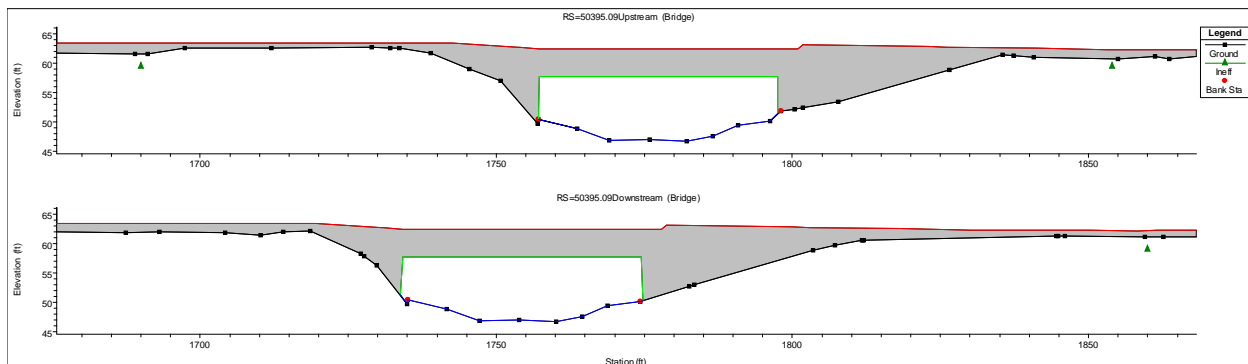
Cross Section of Existing MBTA Bridge in Corrected Effective Model
